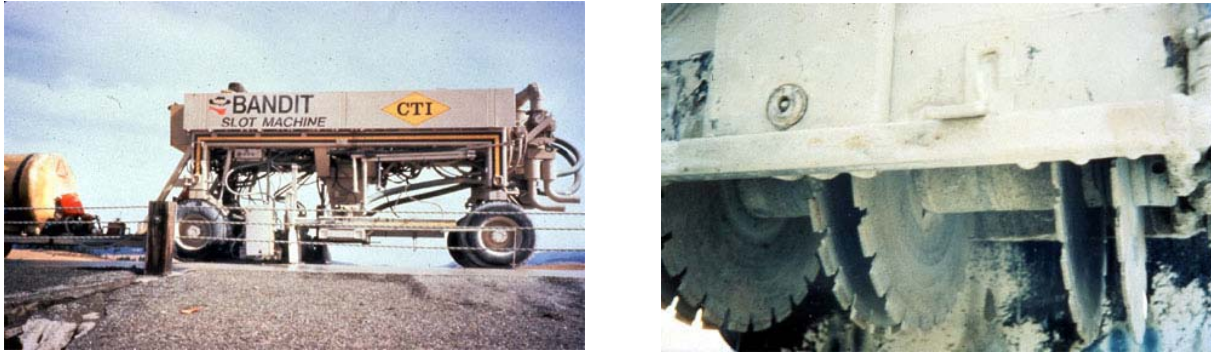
Slot cutting machine with close-up of ganged cutter heads (Caltrans, 2006a)
